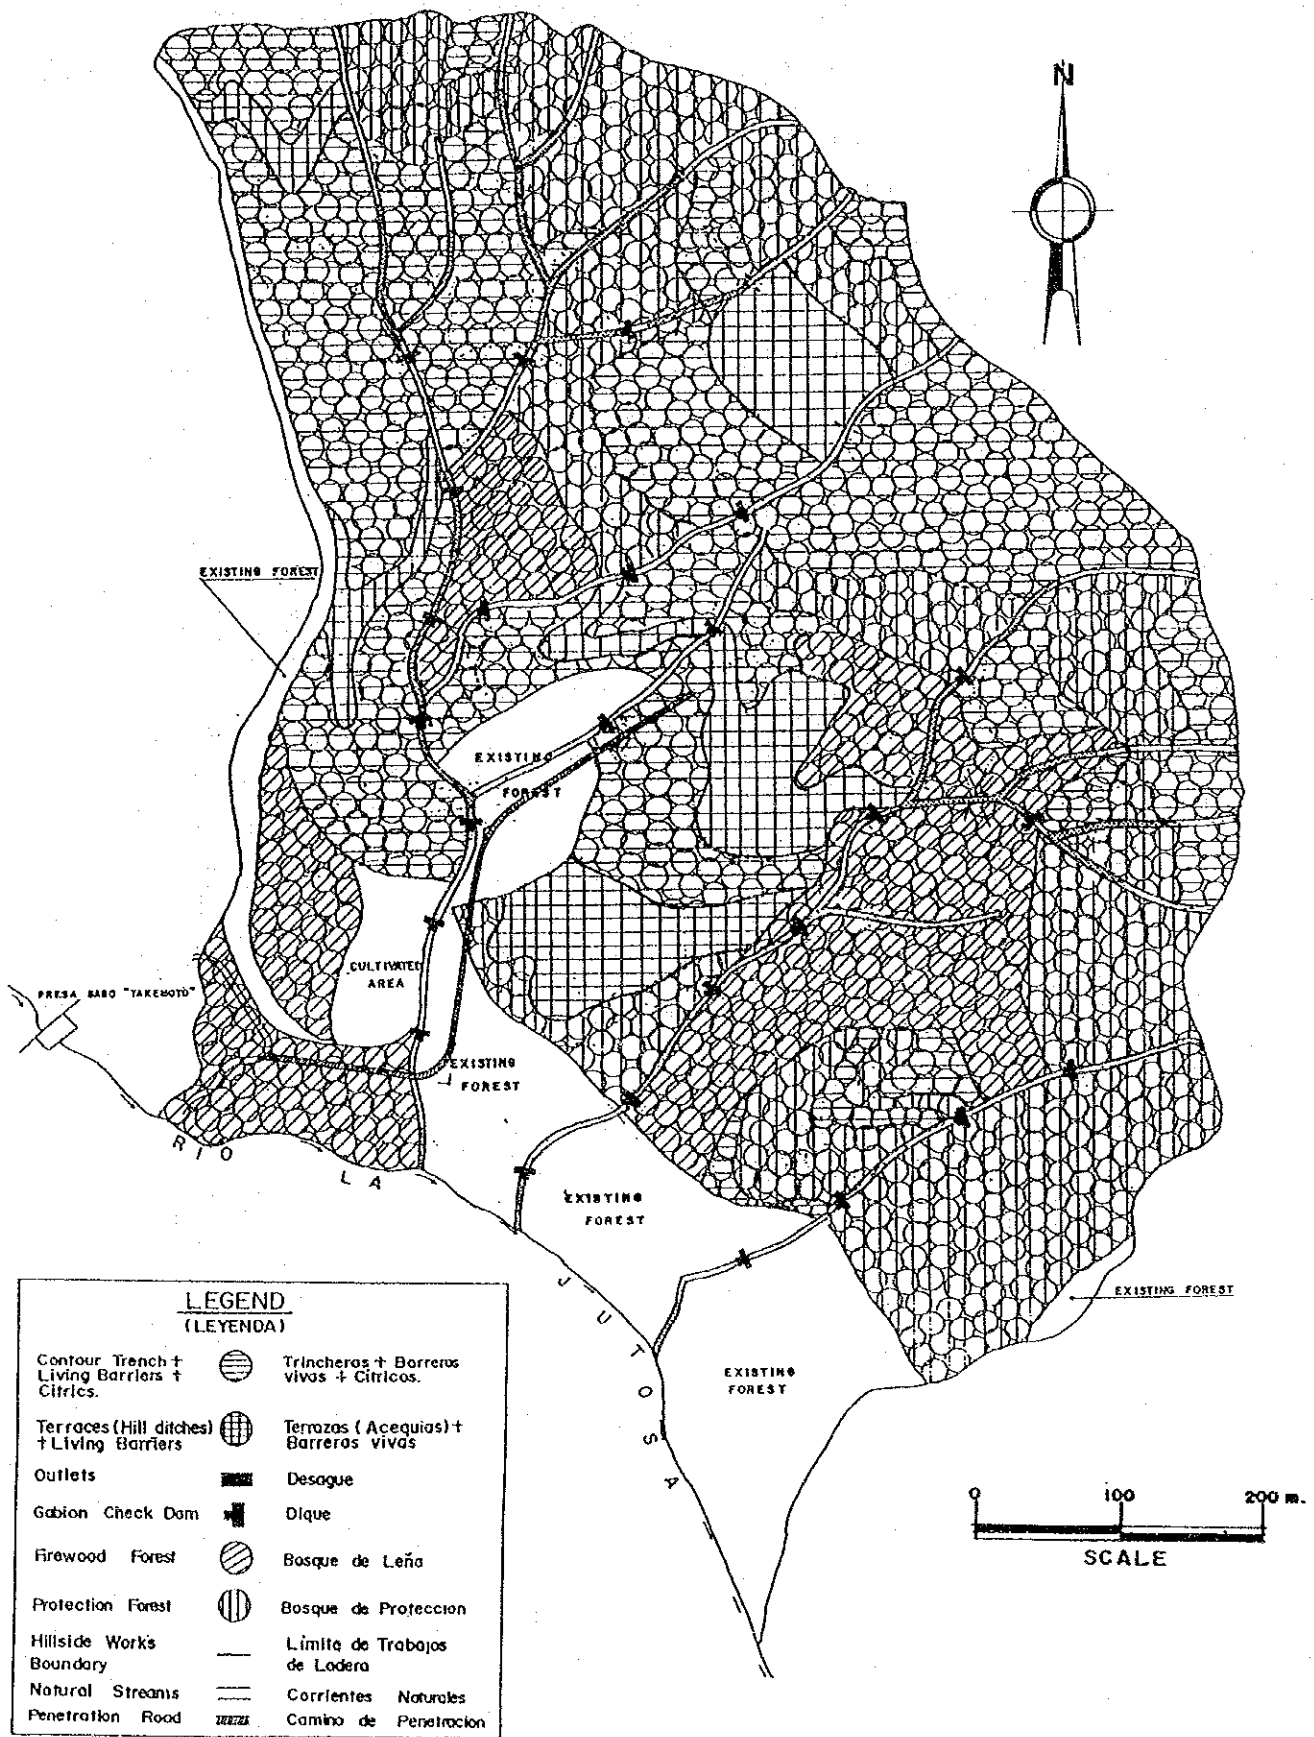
GENERAL PLAN FOR HILLSIDE WORKS
